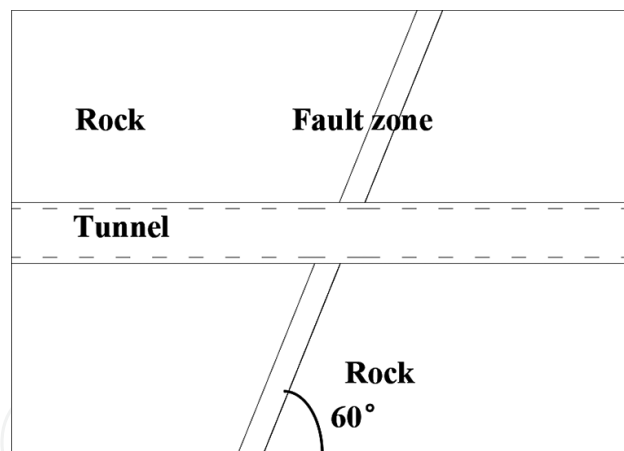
Longitudinal section of the tunnel across fault zone in case 2.
